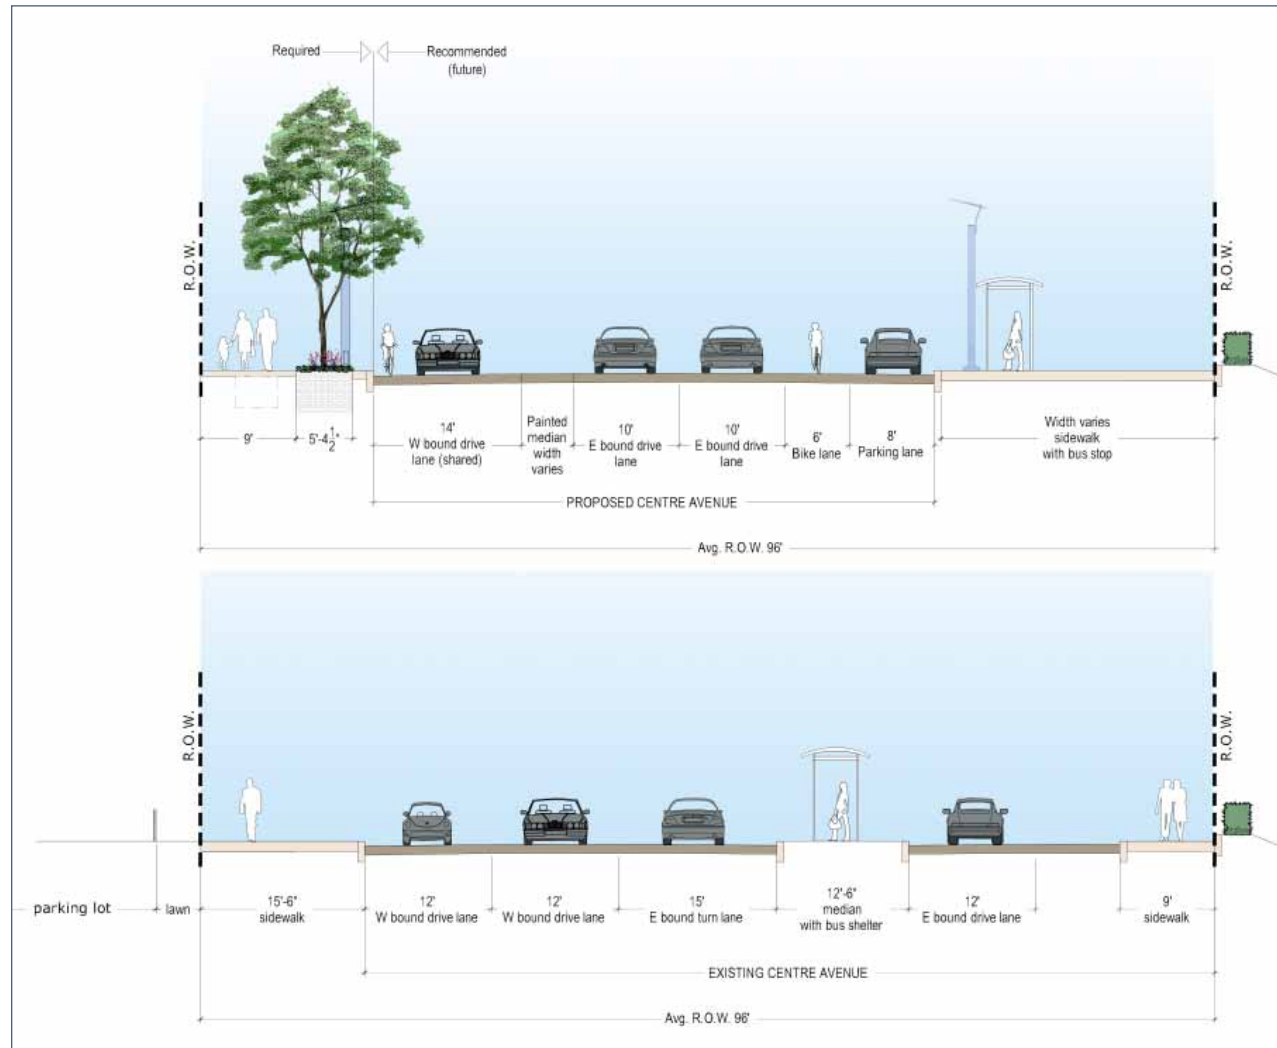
Centre Avenue Section D-D' (at intersection of Centre and Crawford)
